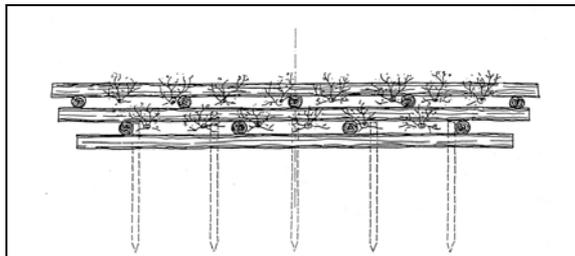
Wooden crib wall, front view (IBLB, 1999)
